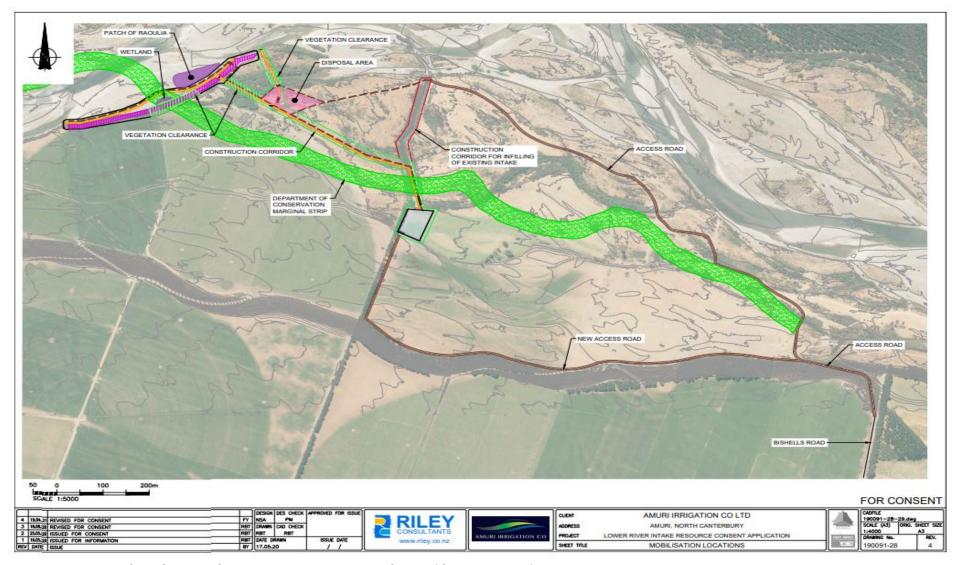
Concept plan of proposal on Hurunui River Marginal Strip (shown in green)
